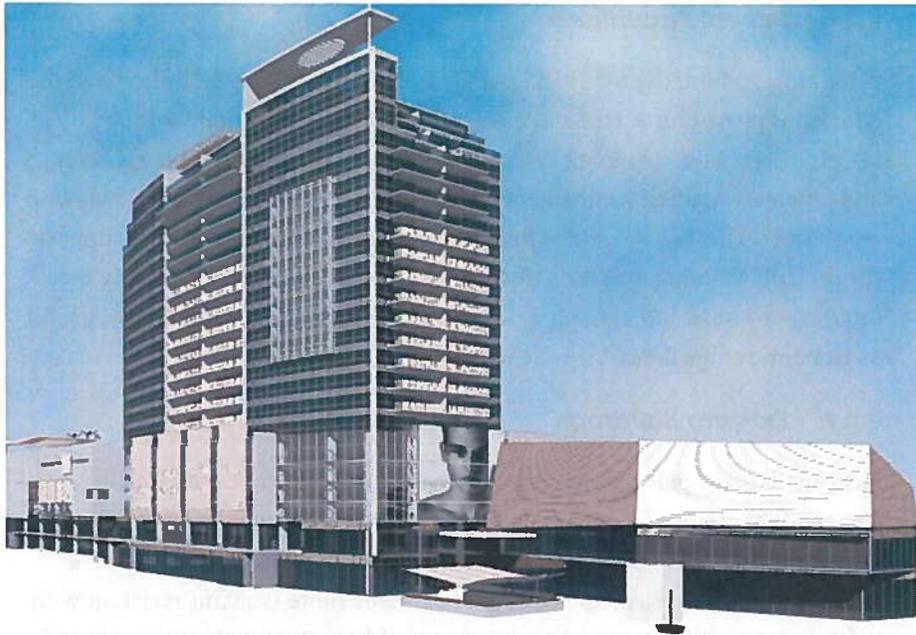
Hotel and convention complex. Meeting rooms, ballrooms, and exhibit spaces located above the tsunami inundation elevation can be used to provide areas of refuge.
